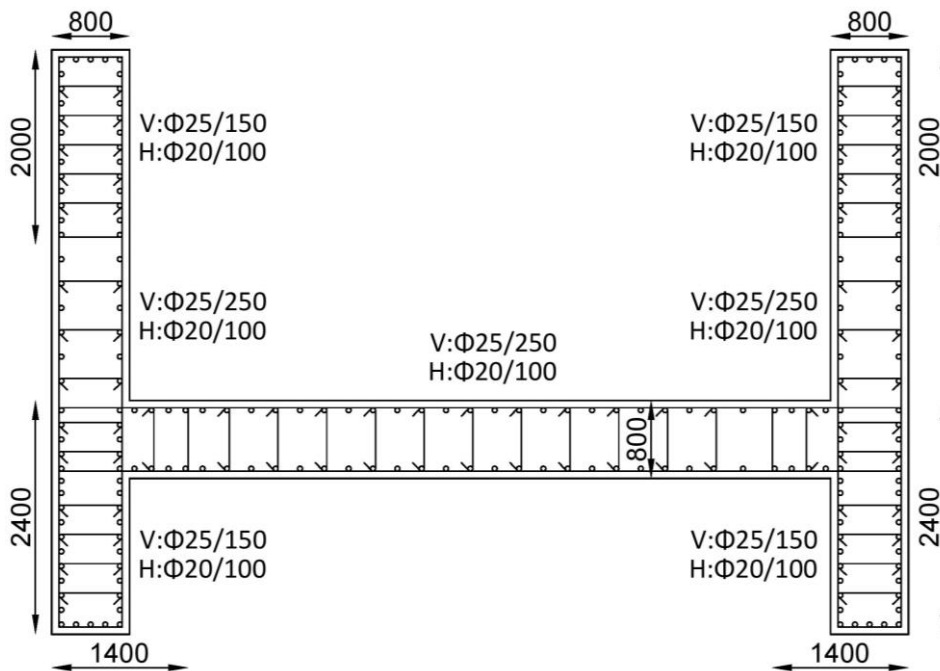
Shear Wall Longitudinal Reinforcement for Stories Between 1 - 10
